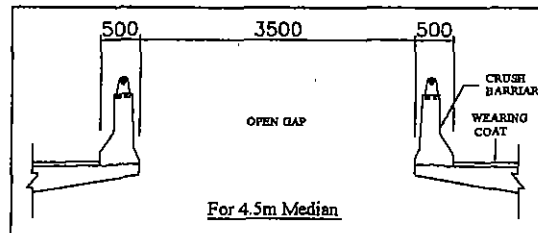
Typical Cross Section (TYPE - VIII A)
